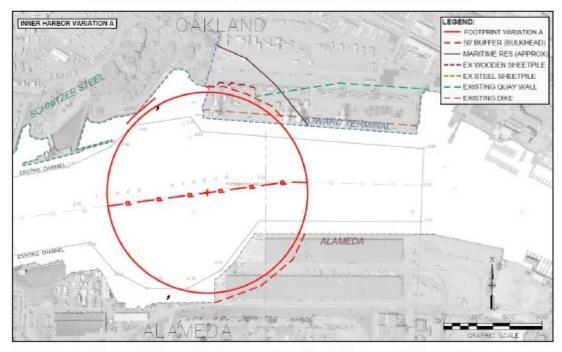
Inner Harbor Turning Basin Proposed Footprint
